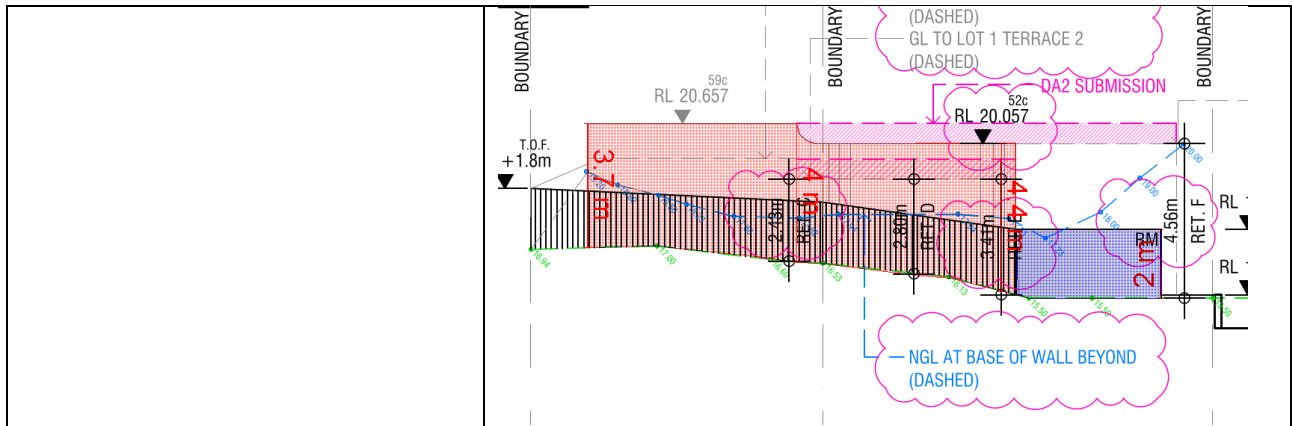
Western Boundary Elevation 2 and Heights of Retaining Walls Marked in Brown and Blue.
